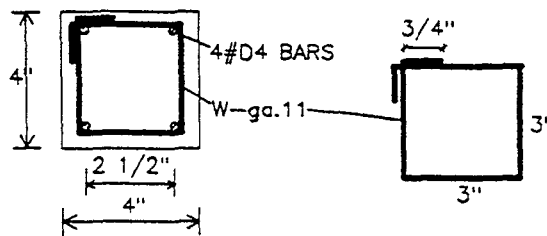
Details of the Beam Steel Reinforcement ( Continued )
